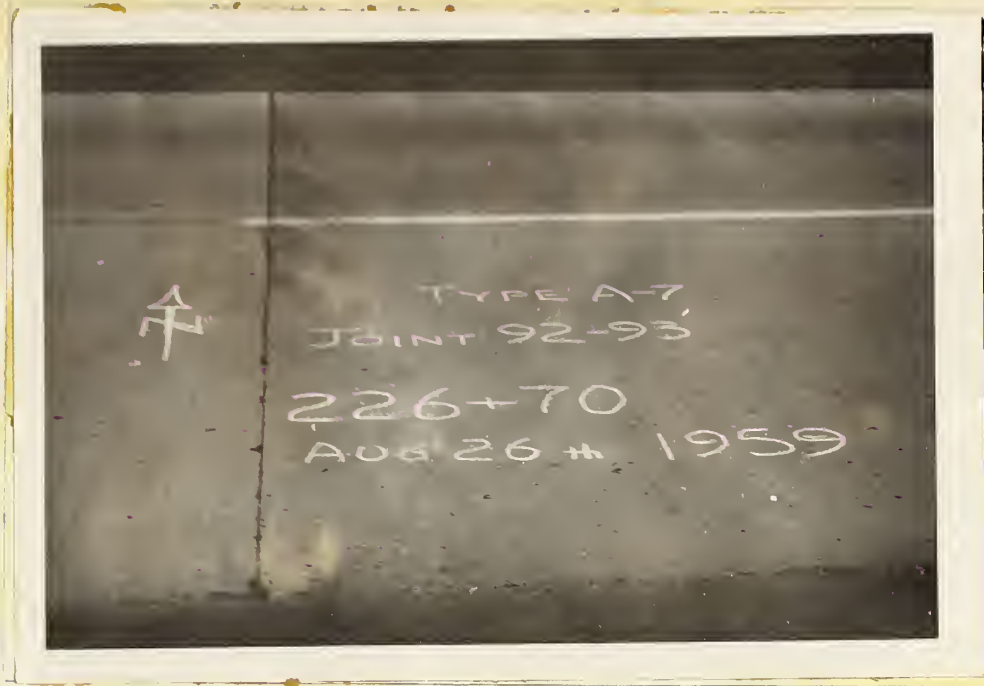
SOIL STAINS AT TRANSVERSE JOINT
